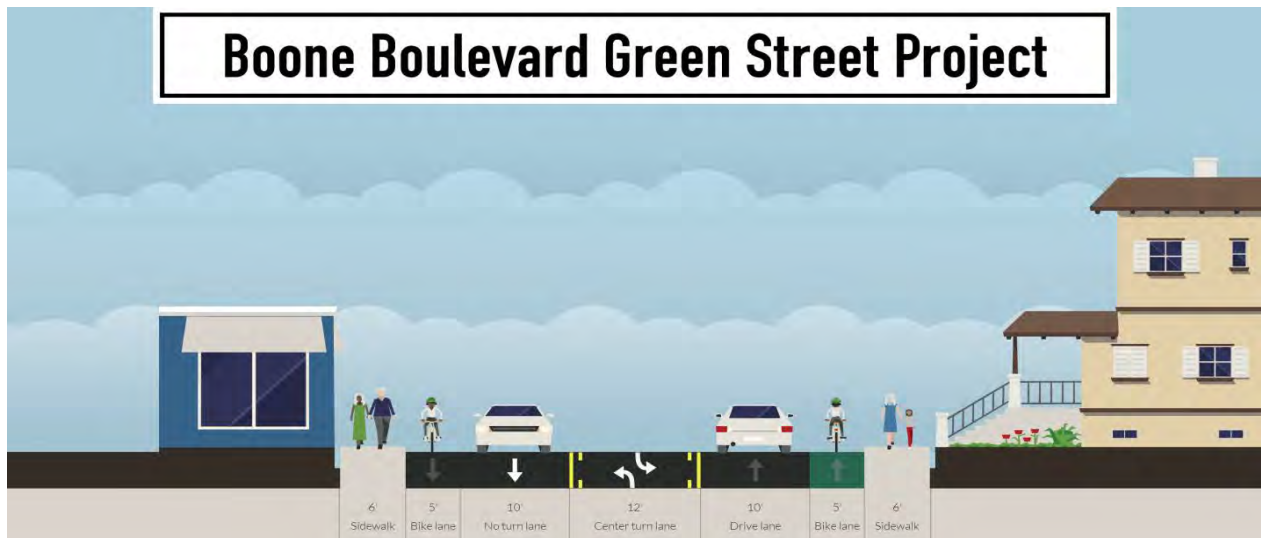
Cross-section of Joseph E. Boone Street (at the intersections of Brawley Drive, Sunset Avenue, and Vine Street) if DWM implements the proposed project as planned. (Source: www.streetmix.net 2013)
